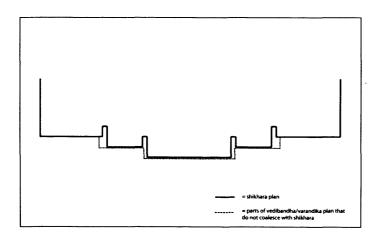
Śikhara plan over vēdībandha plan if the latā is made slimmer.
